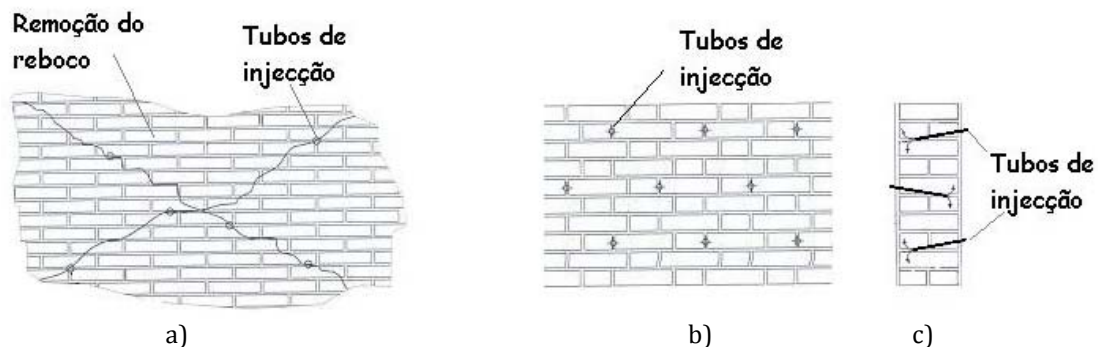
(a) injection in external/face diagonal crack; (b) injection for the internal cracks; (c) side view [Roque, 2002]
